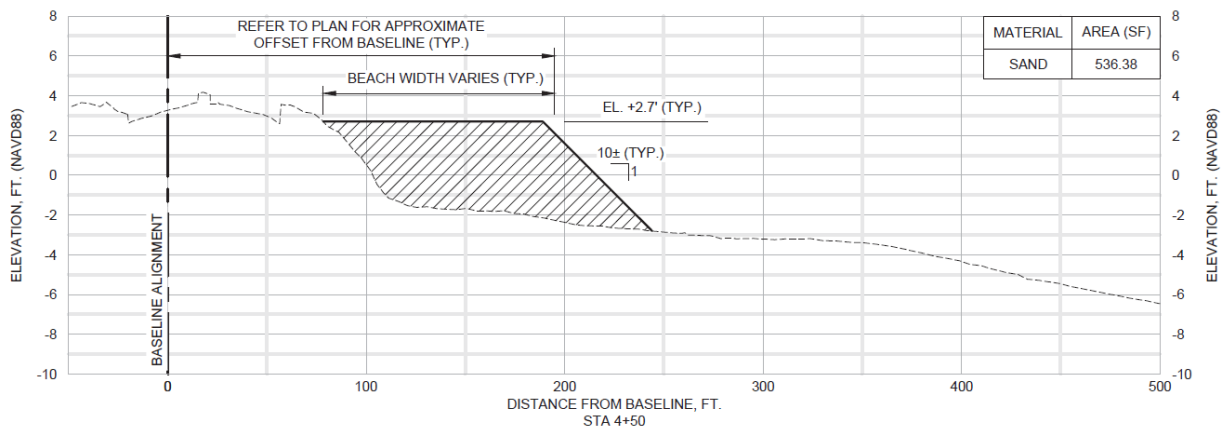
Typical Beach Fill Cross Section (Modified from HDR Construction Drawings)
